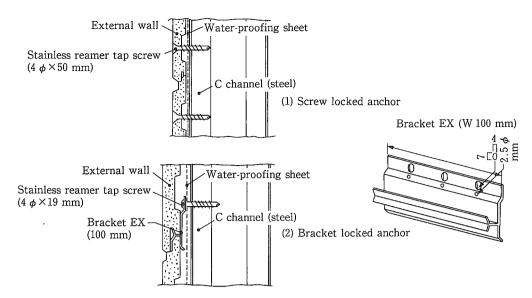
External wall anchoring techniques (Screw locked anchor vs.Bracket locked anchor)
